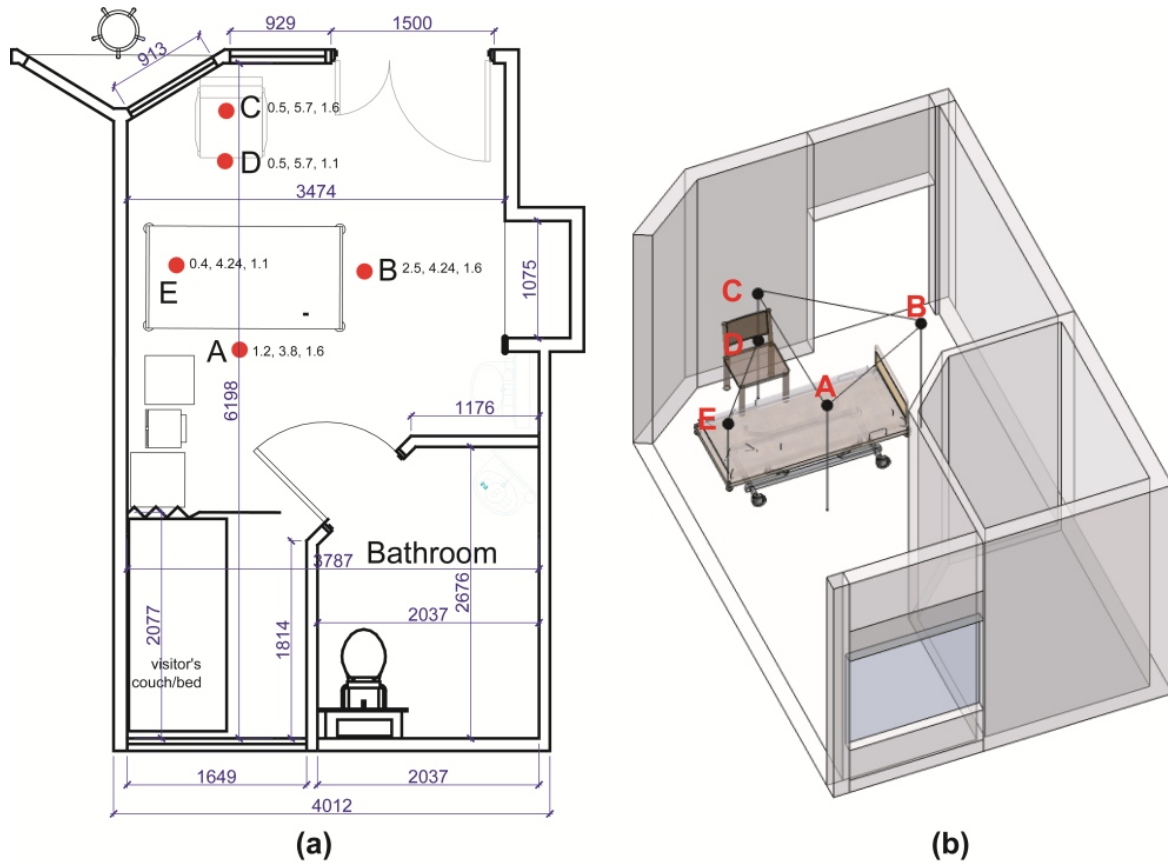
6: Layout of GOSH ward showing POIs in (a) Plan and (b) 3-Dimension
